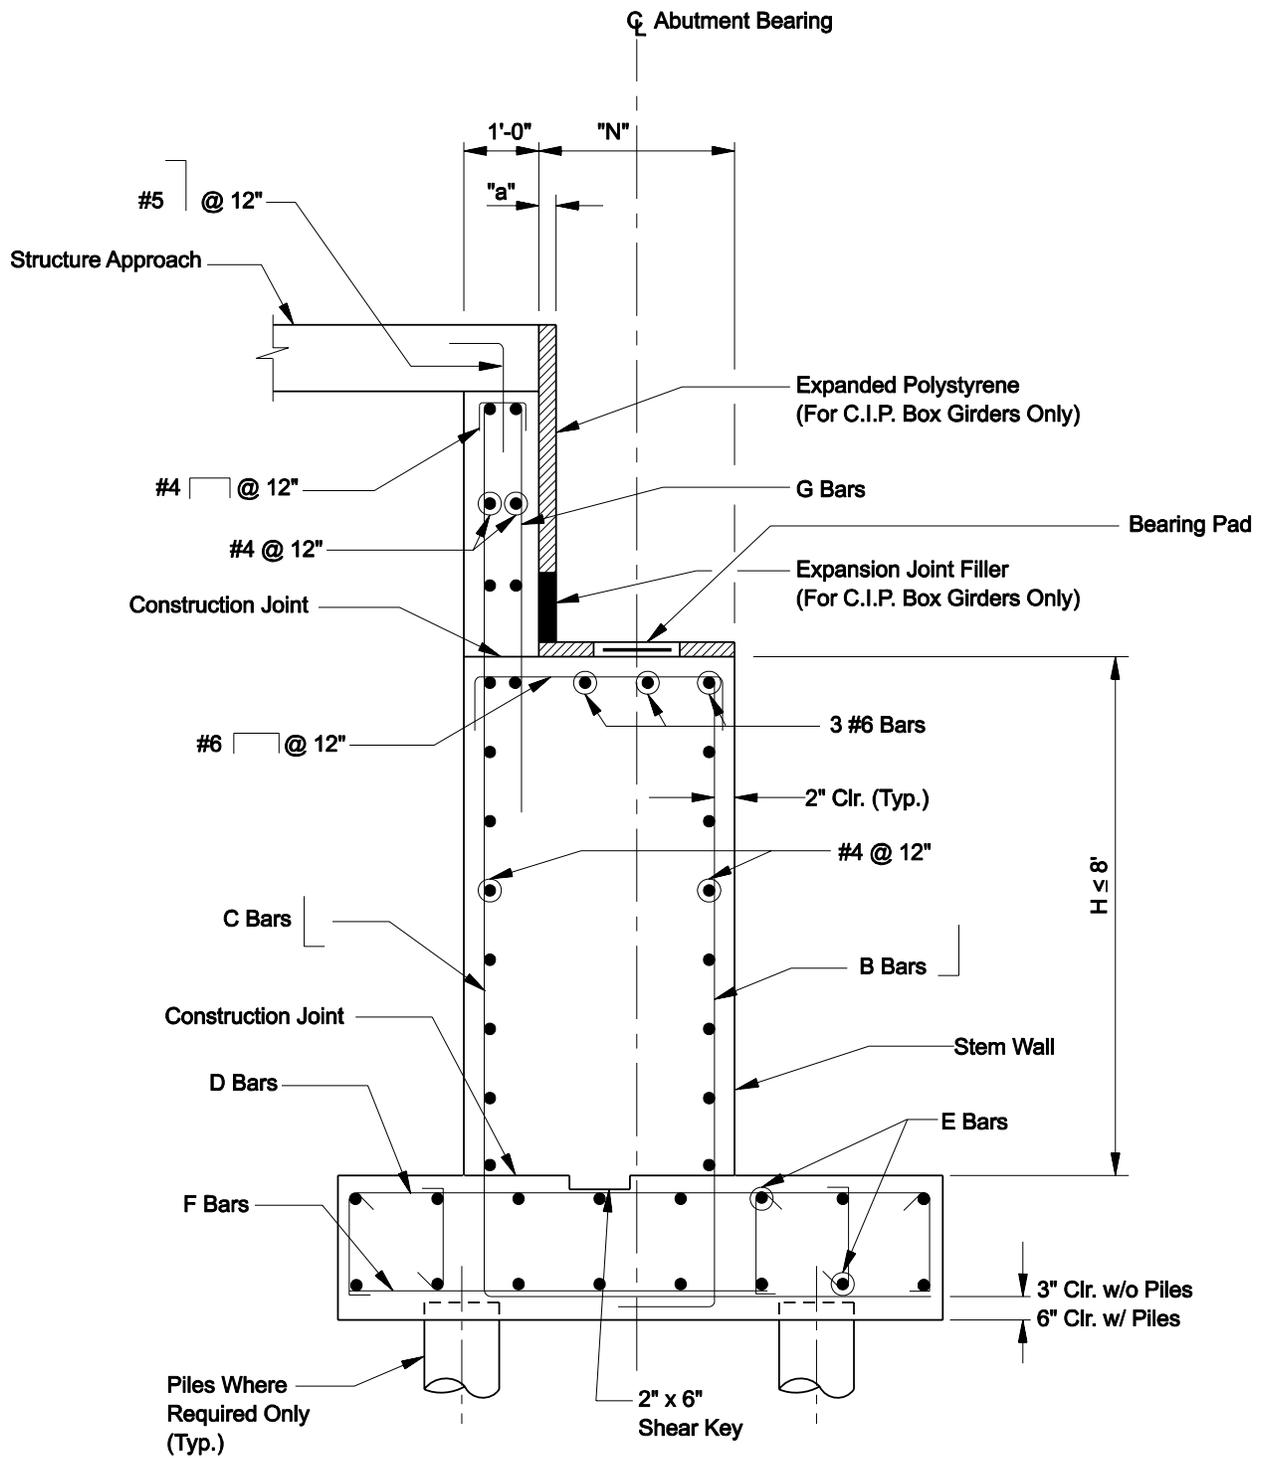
E shows a typical dozer abutment. Dozer abutment details shall meet the following requirements:
